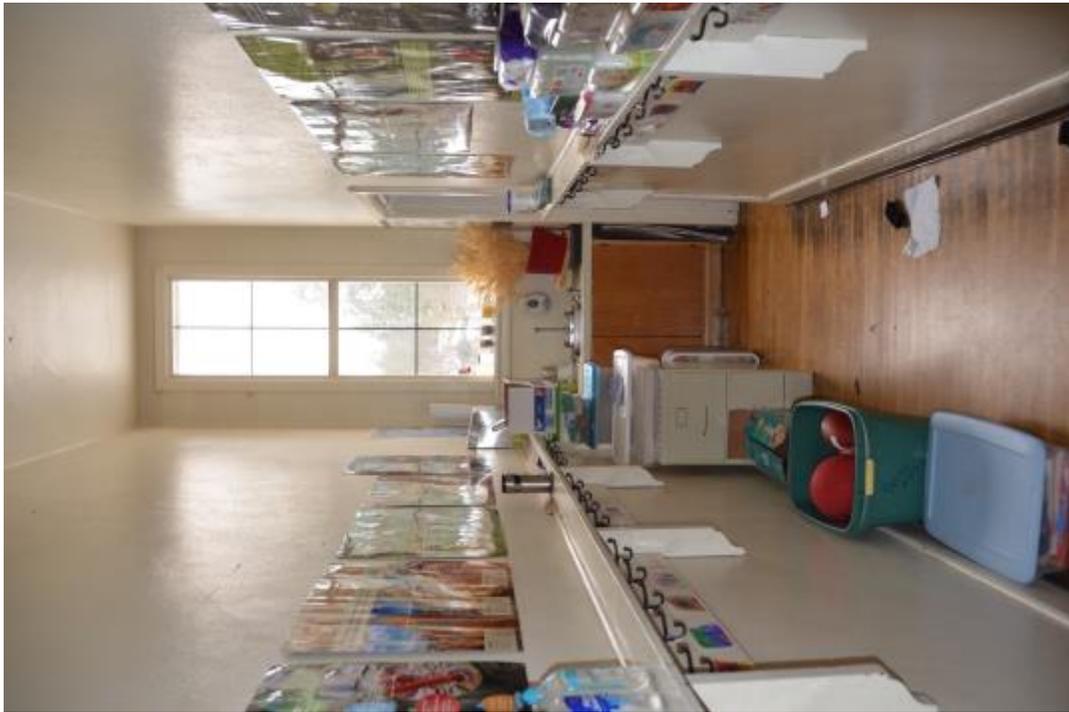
Looking South at Cloakroom in Classroom in 1930-31 Addition
